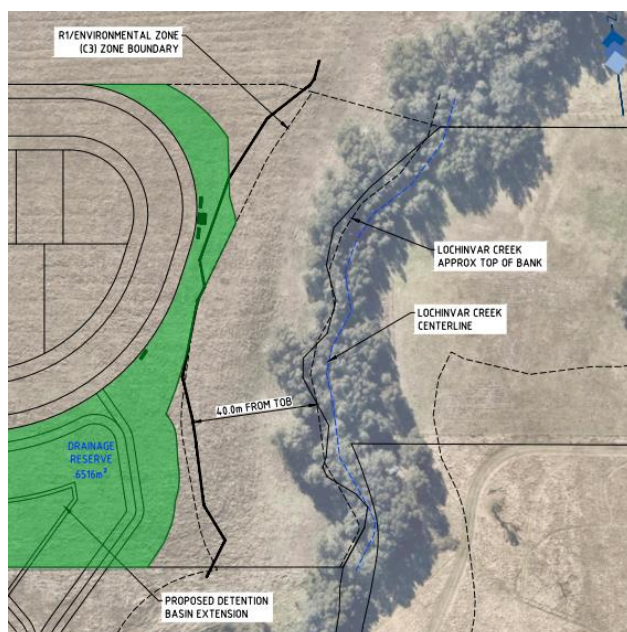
Plan detailing 40m riparian setback relative to proposed works
